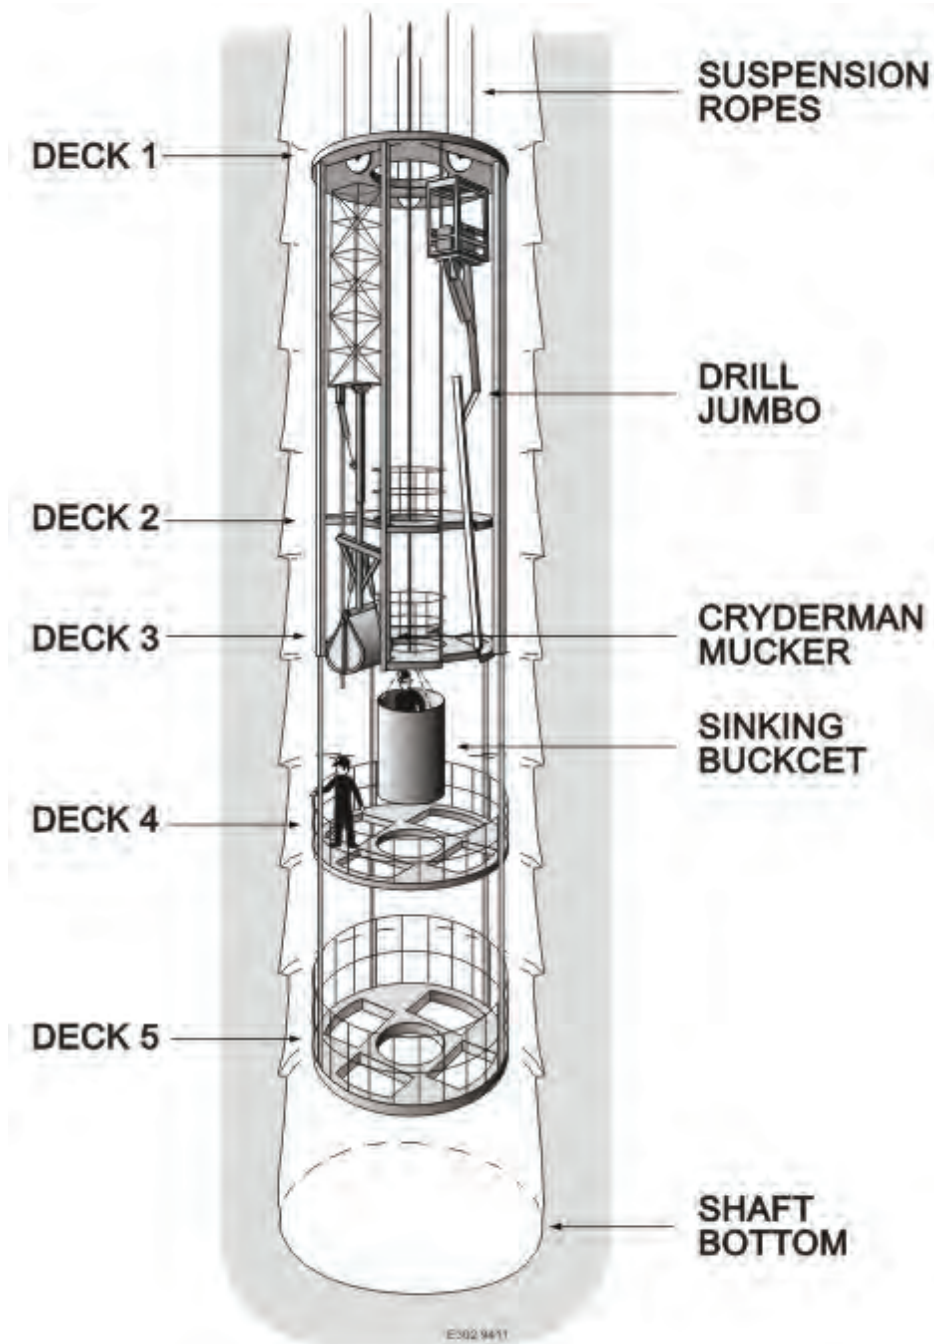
Galloway Stage Used in URL Lower Shaft Extension Excavation
